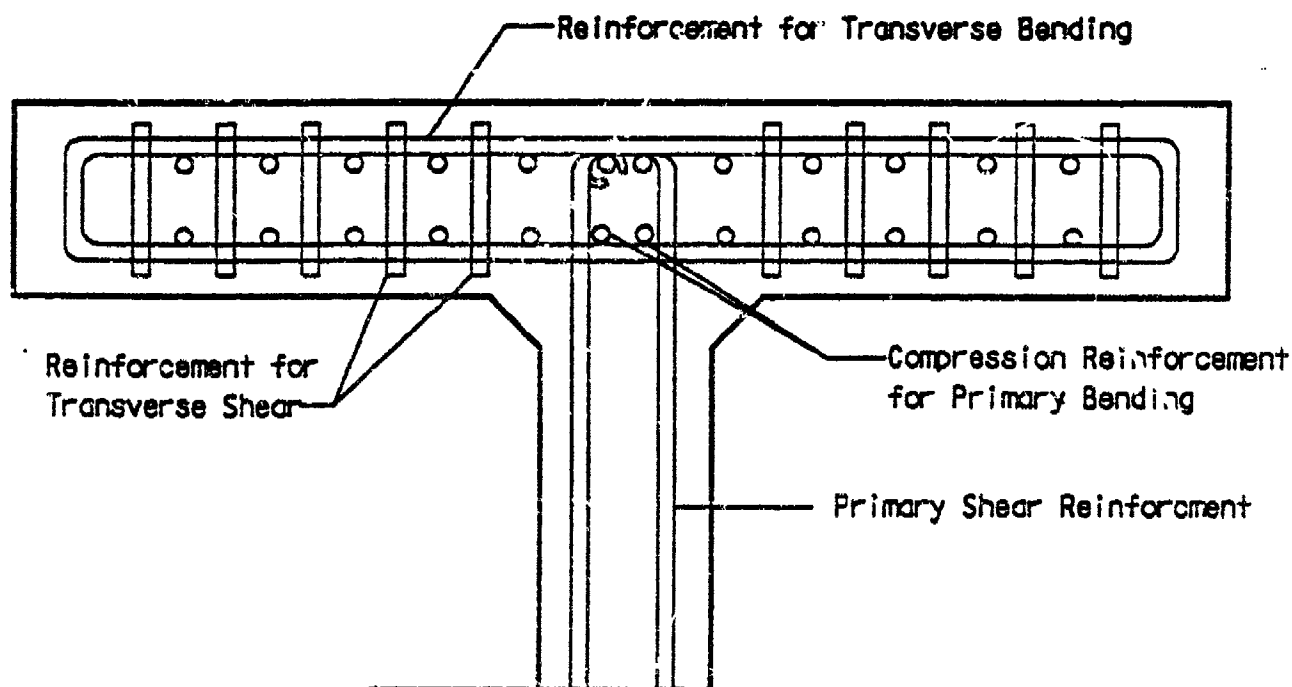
General Configuration of Reinforcing for Slab Portion of Reinforced Concrete of Prestressed Beam.
